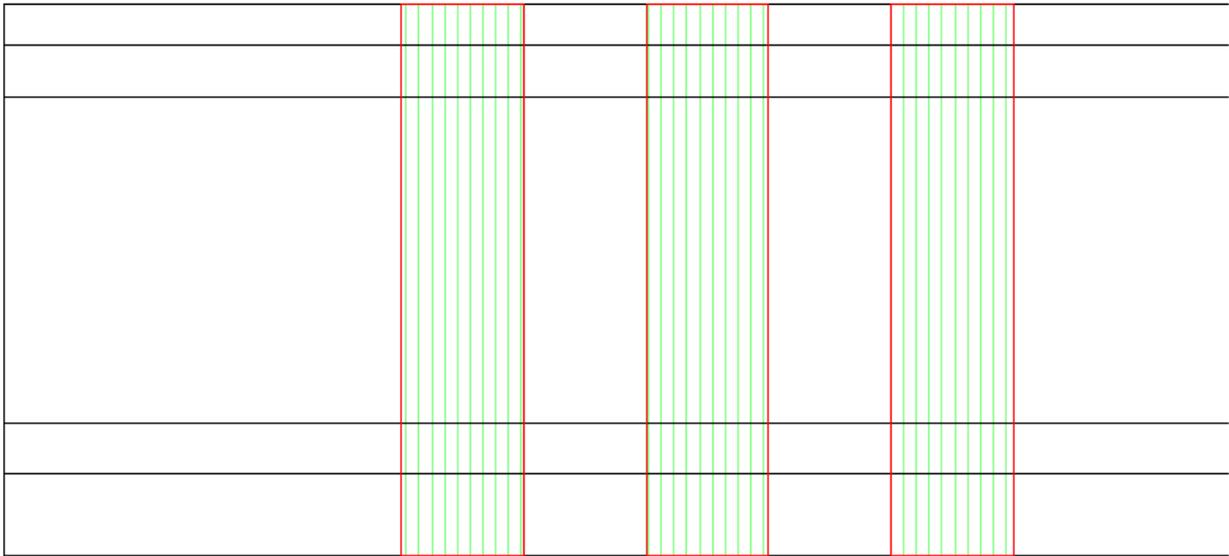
San Antonio I-Girder elevation view with all CFRP sheets and anchors
